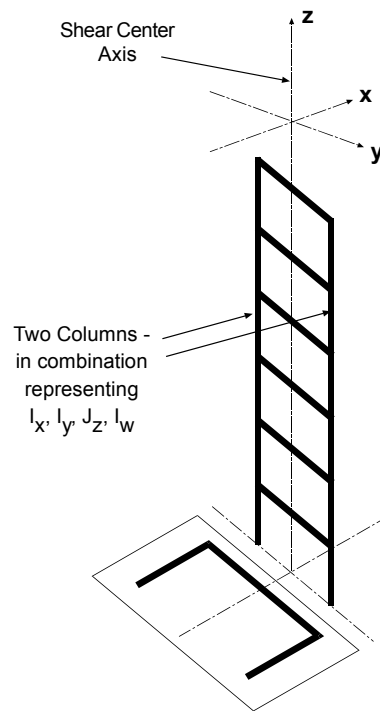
Two-Column Model of a U Shaped Core [1]
